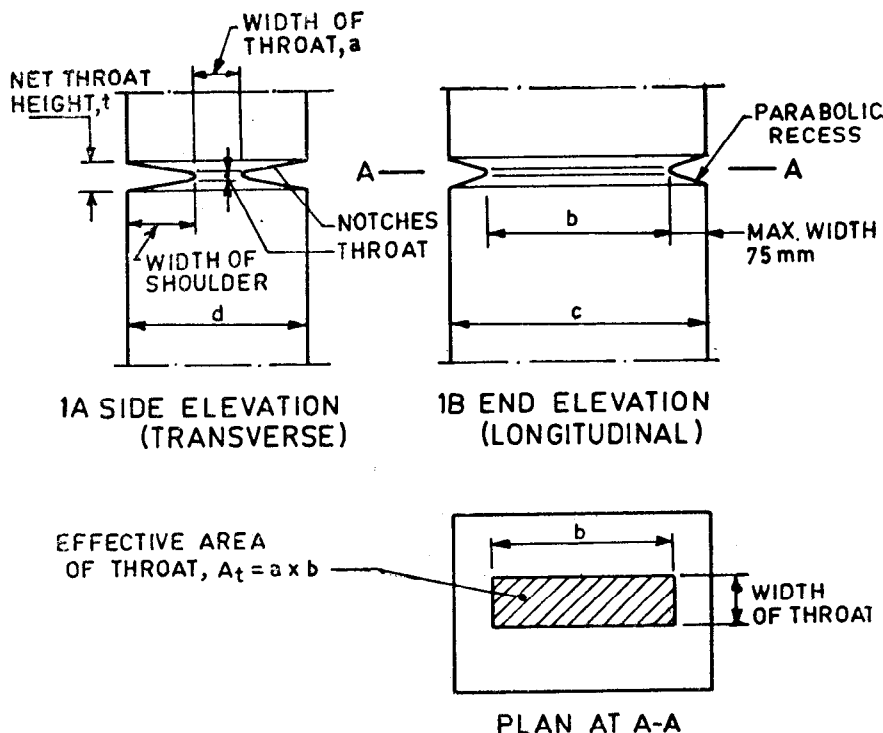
TYPICAL RECTANGULAR HINGE — LAYOUT AND SHAPE — *Contd
